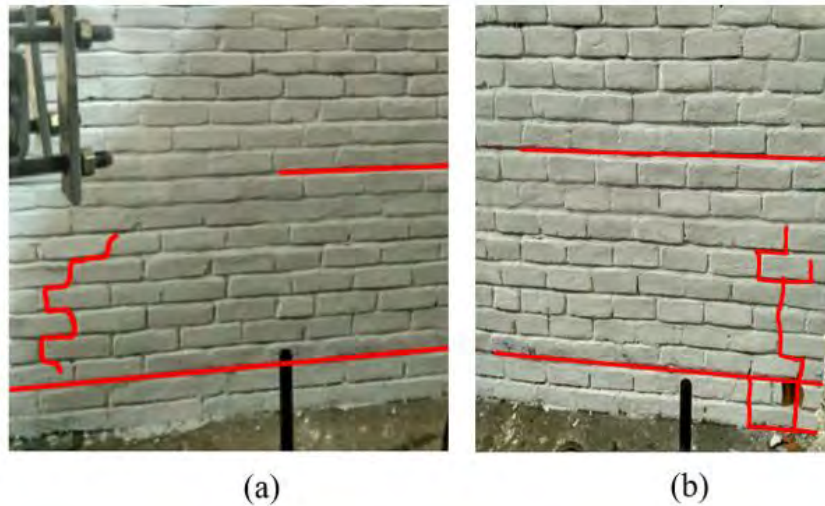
Cracks developed at 1.05g in east wall (out-of-plane wall)
